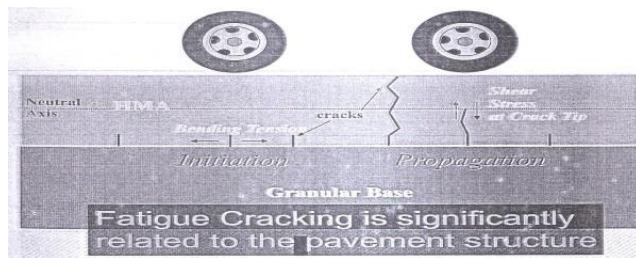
Fatigue Cracking Process in Asphaltic Concrete Pavement (NCAT, 2008c).
